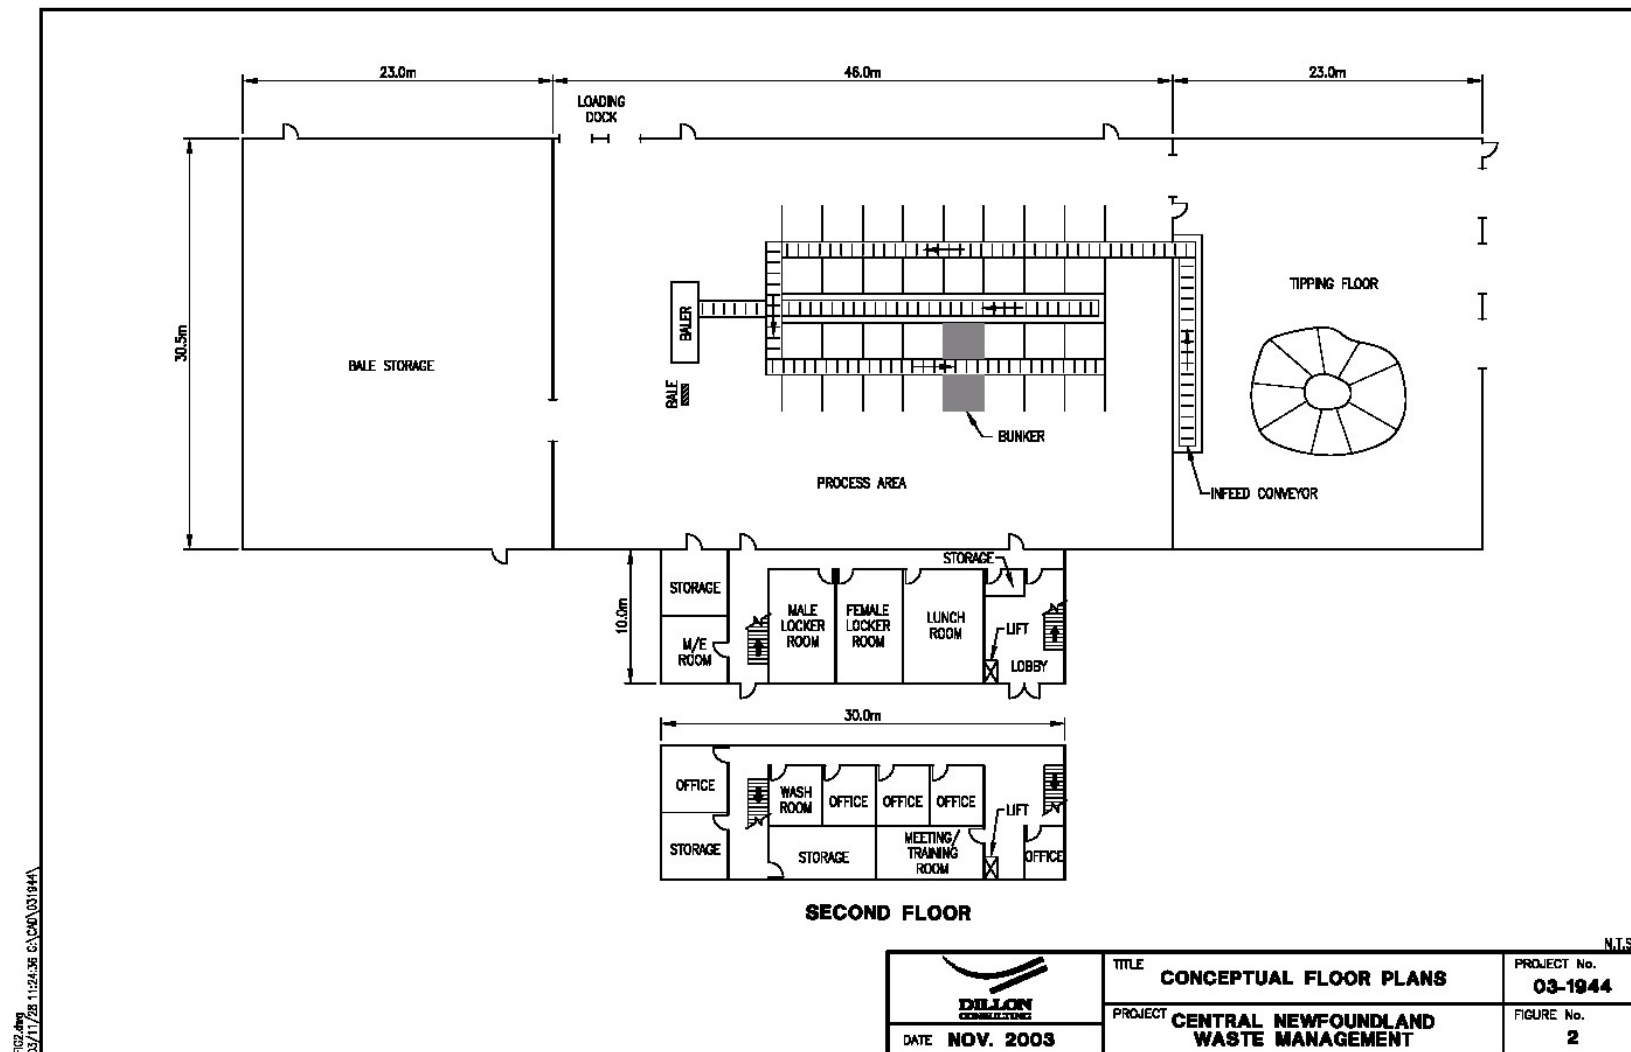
Concept Floor Plan for Material Recovery Facility.
